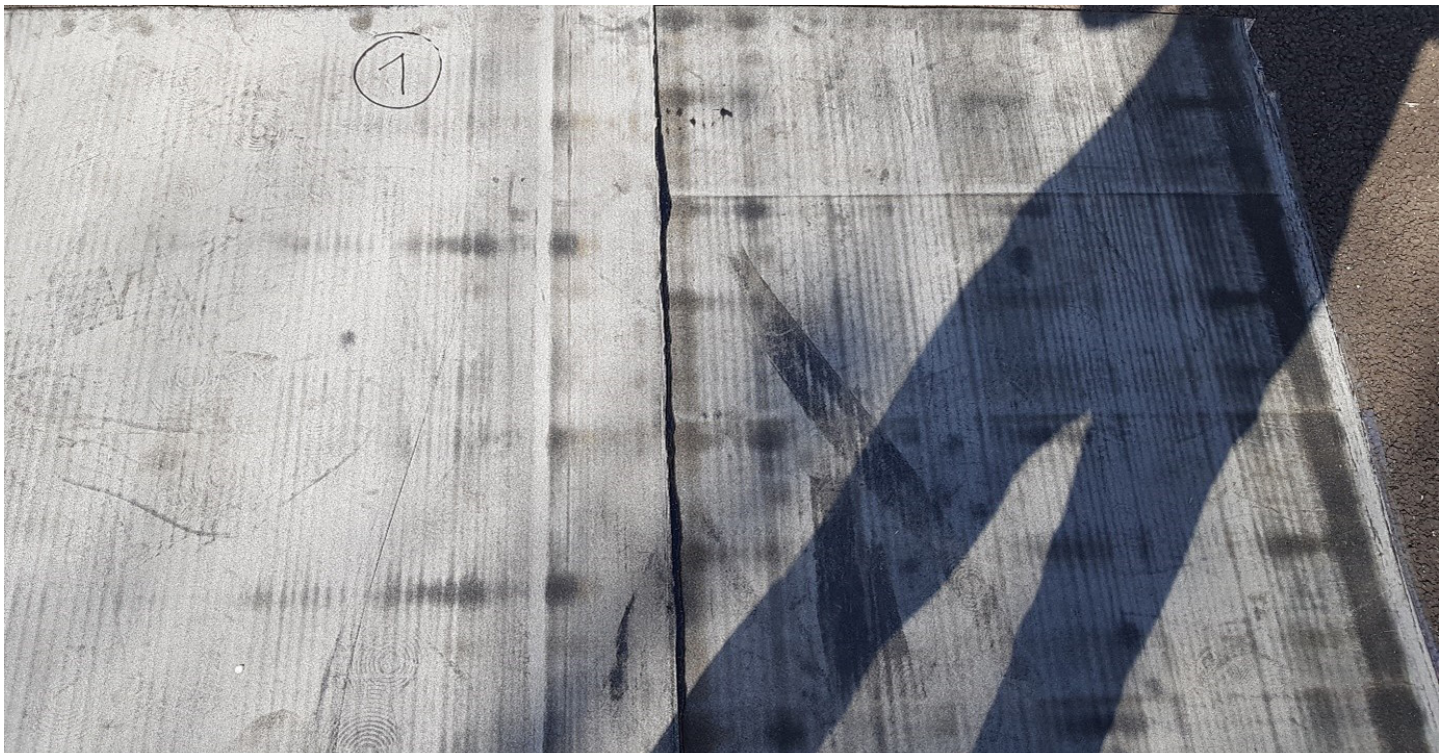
View of a completed trial weld using the Bitumat B2 on the Teranap TP631 showing a consistent bleed of bitumen along the weld.
